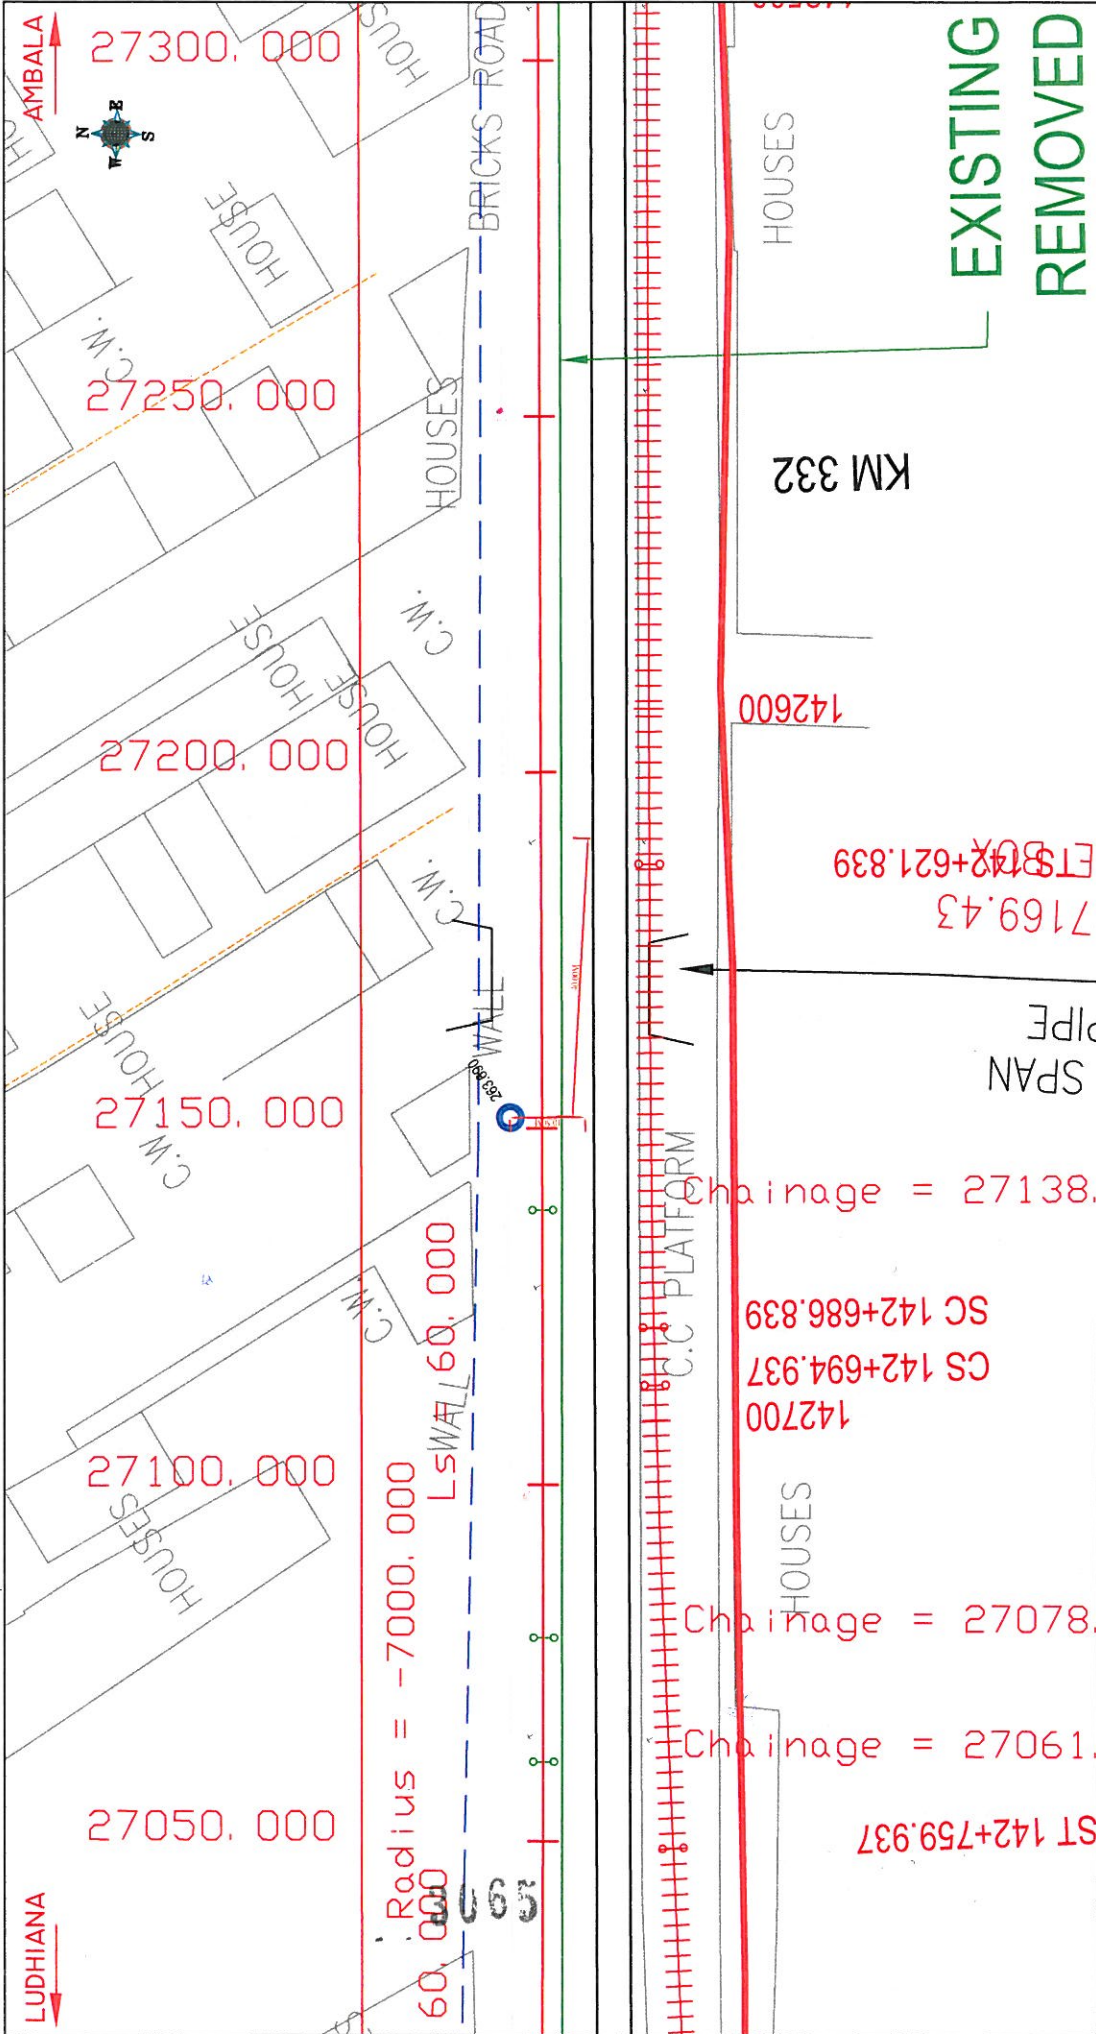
LOCATION PLAN OF PROPOSED MINOR BRIDGE AT CH. 332/1-3	RL OF BH-1 = 263.690	PROJECT :- LUDHIANA-AMBALA (DFCCIL)	DESIGN :- CONSULTING ENGINEERS GROUP LTD. E-12, Meji Colony, Malviya Nagar, Jaipur-17 Tel: +91-141-2520699, 2521899, 2520556 Fax: 2521946, E-Mail: ceg@cegroupindia.com
